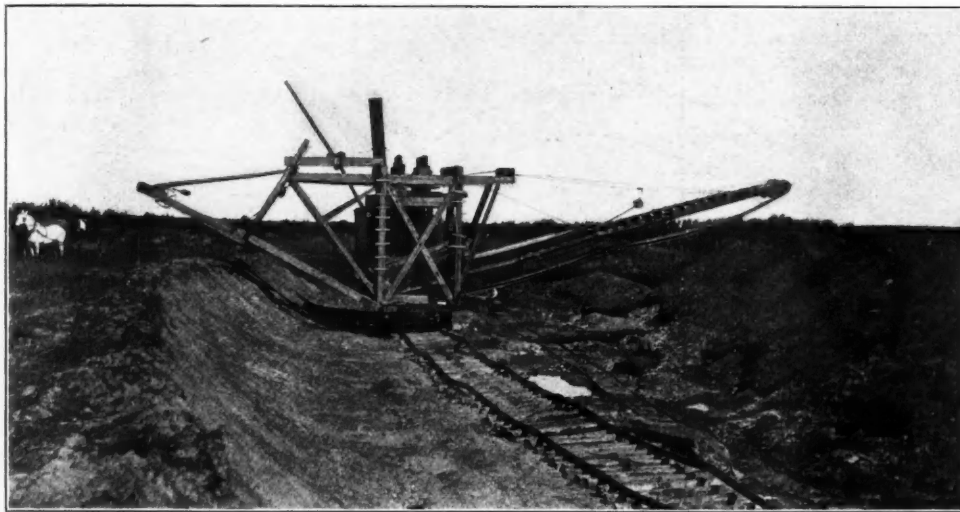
STEAM SHOVEL STRIPPING COAL BED.
